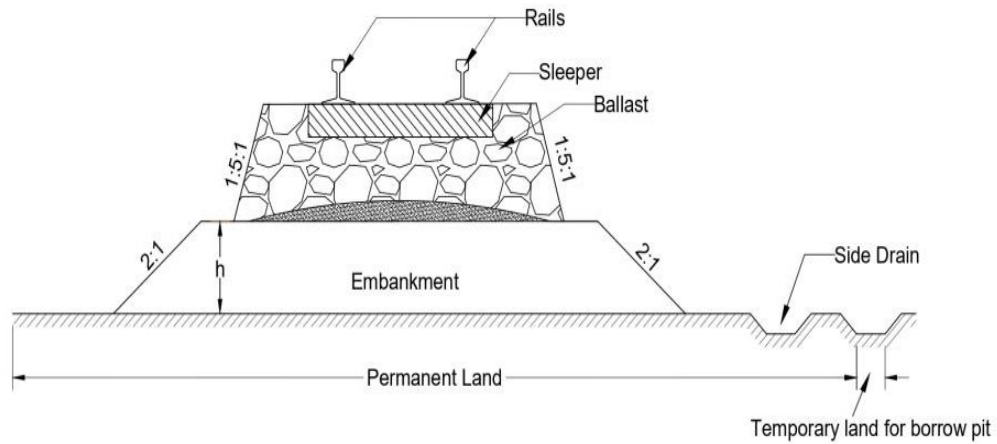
Typical cross section of single line broad gauge track in embankment (on straight track)
